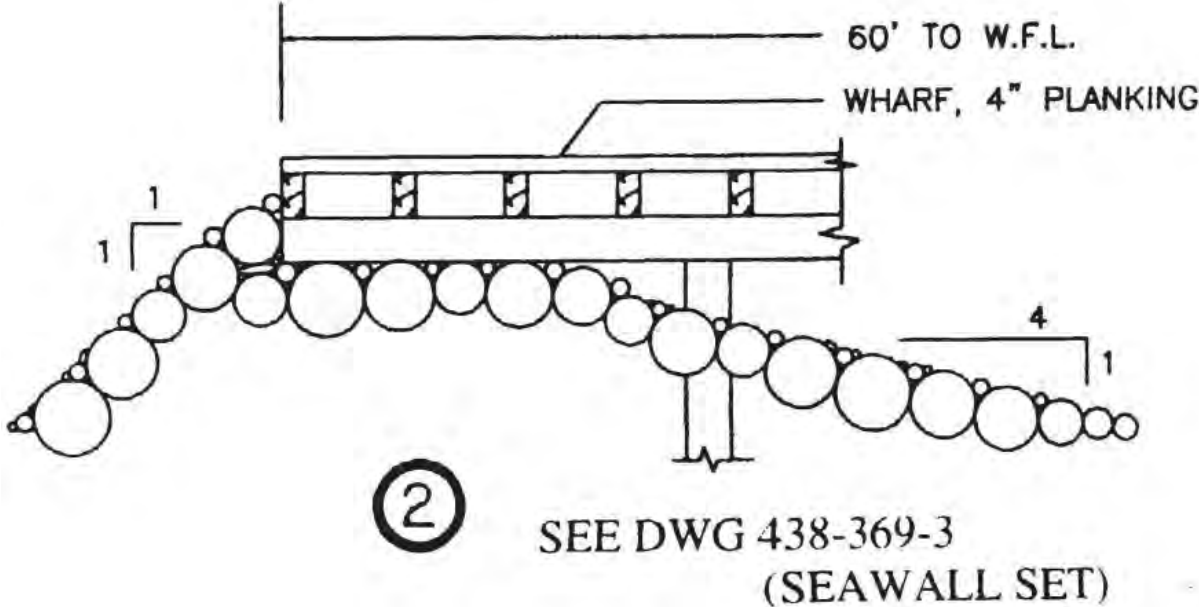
Seawall Section B, Bulkhead Type 2
